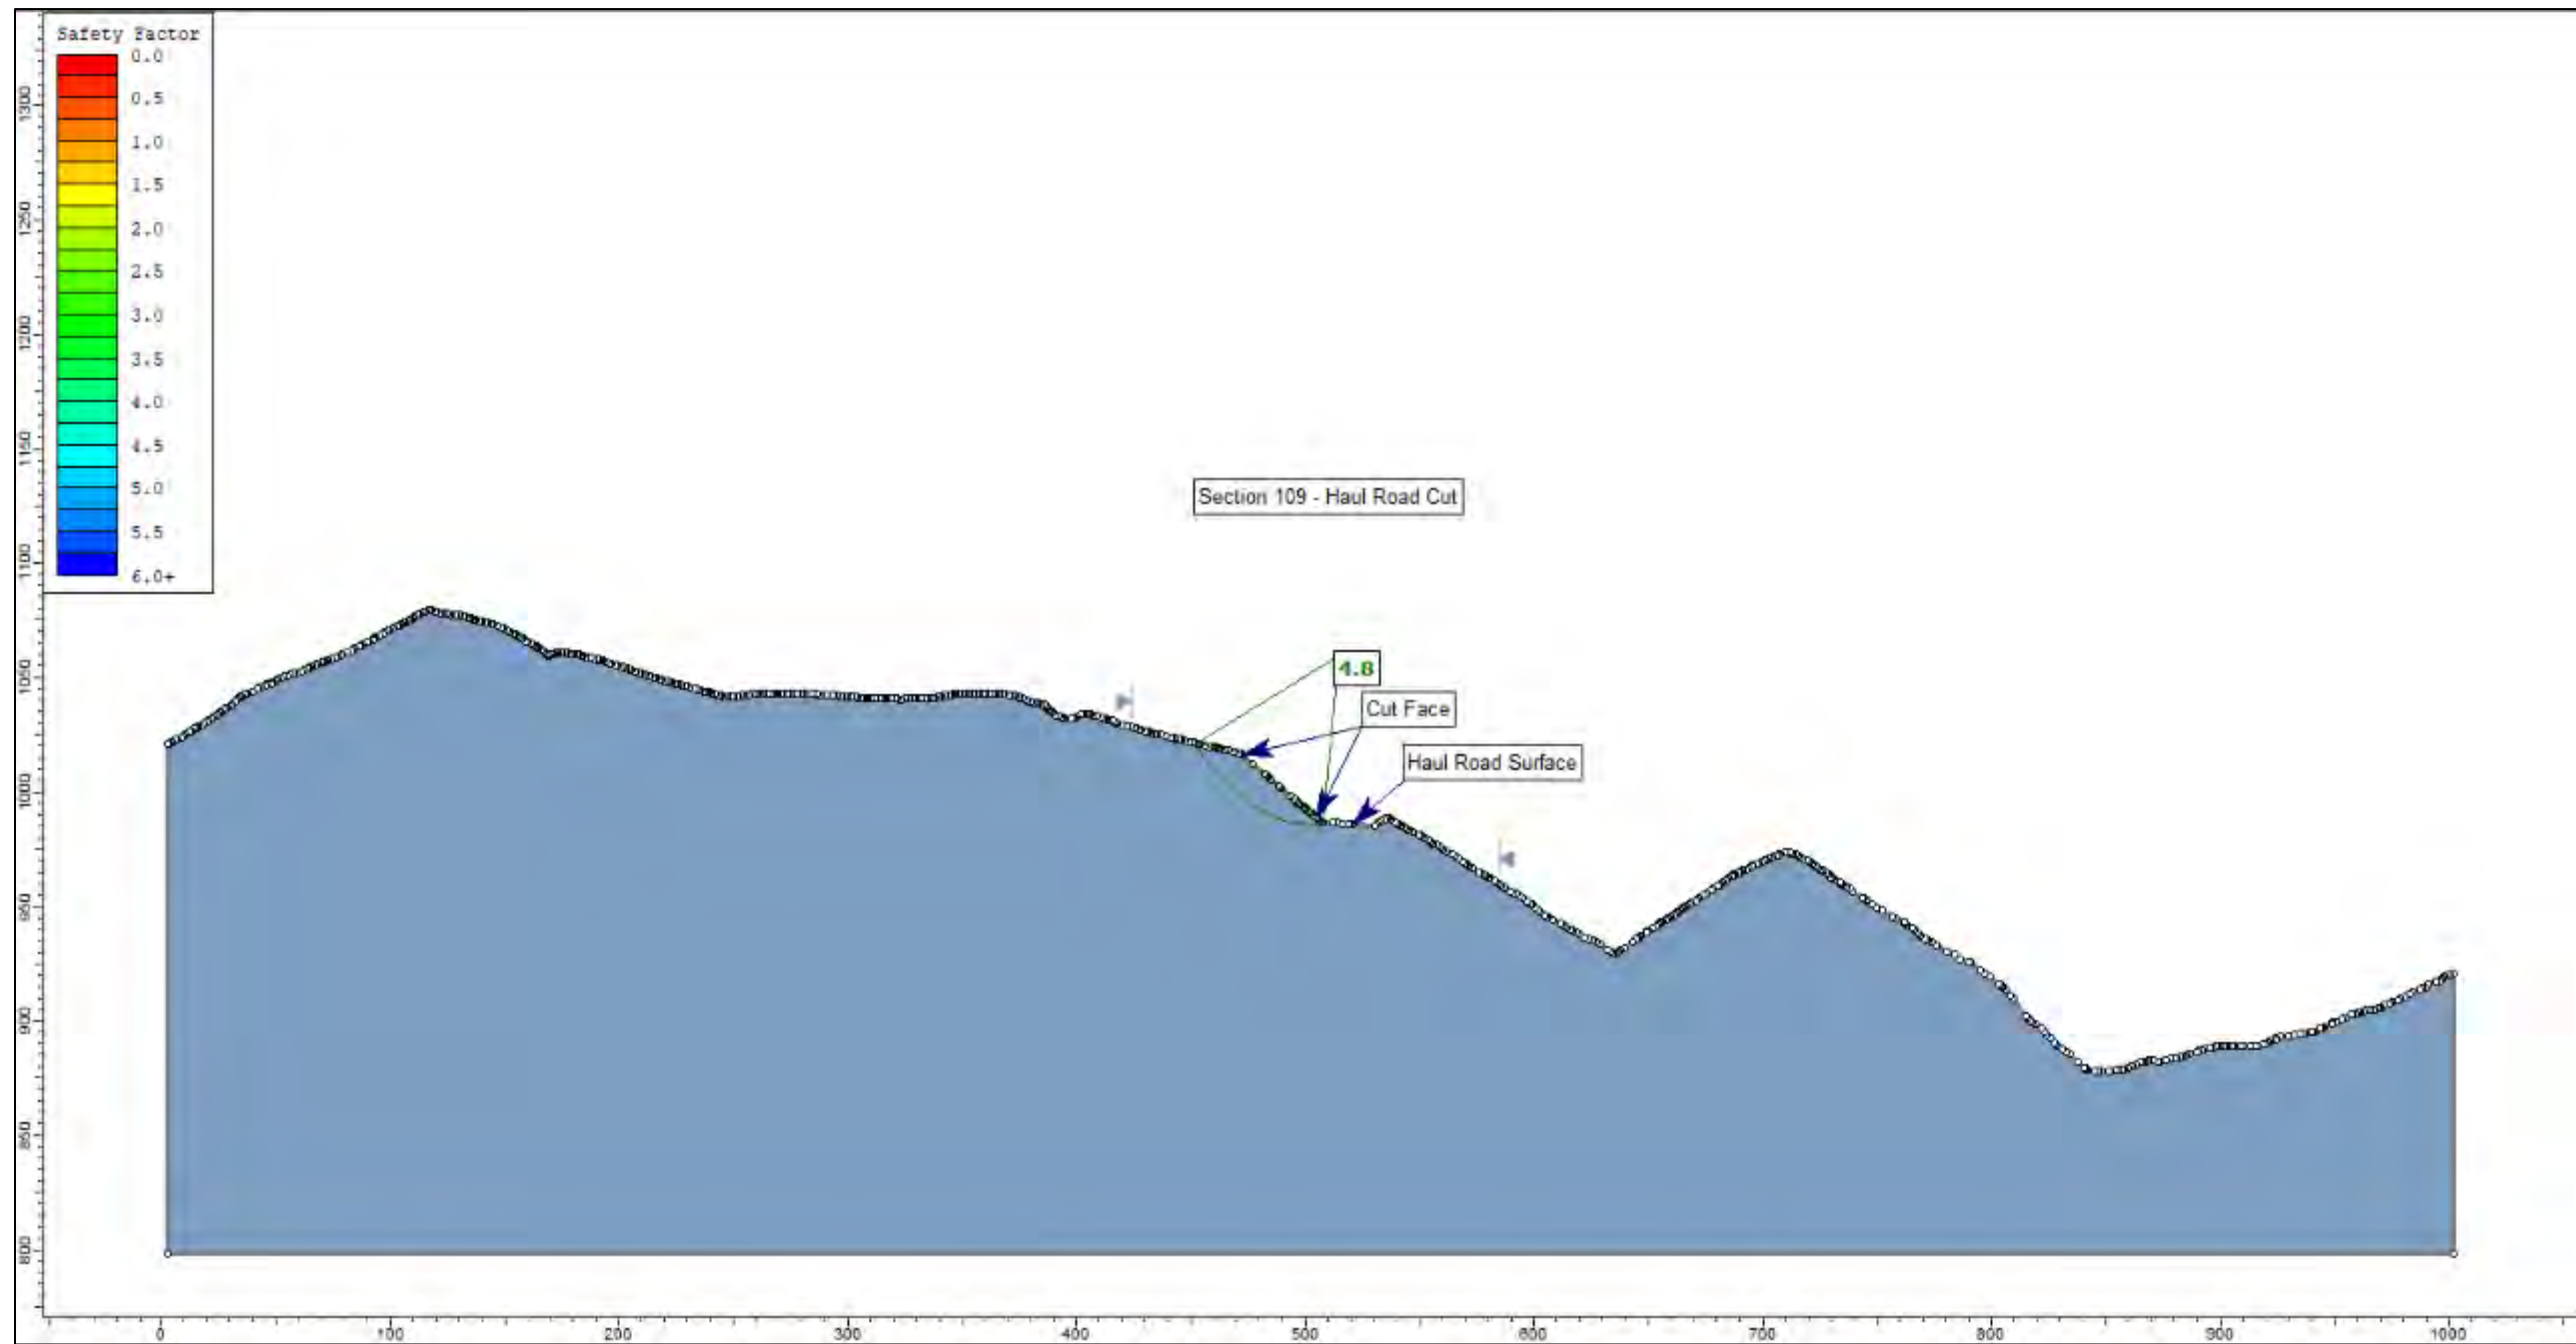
Haul Road Cut - Section 109 – SLS Conditions.
